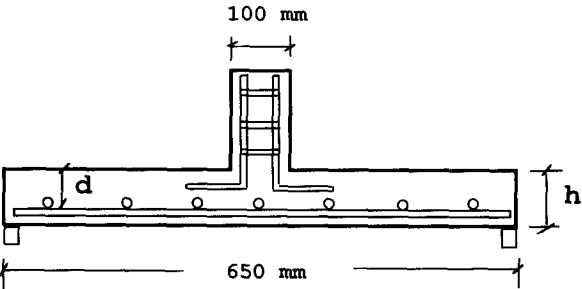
Typical dimensions and reinforcement details of the specimens.
